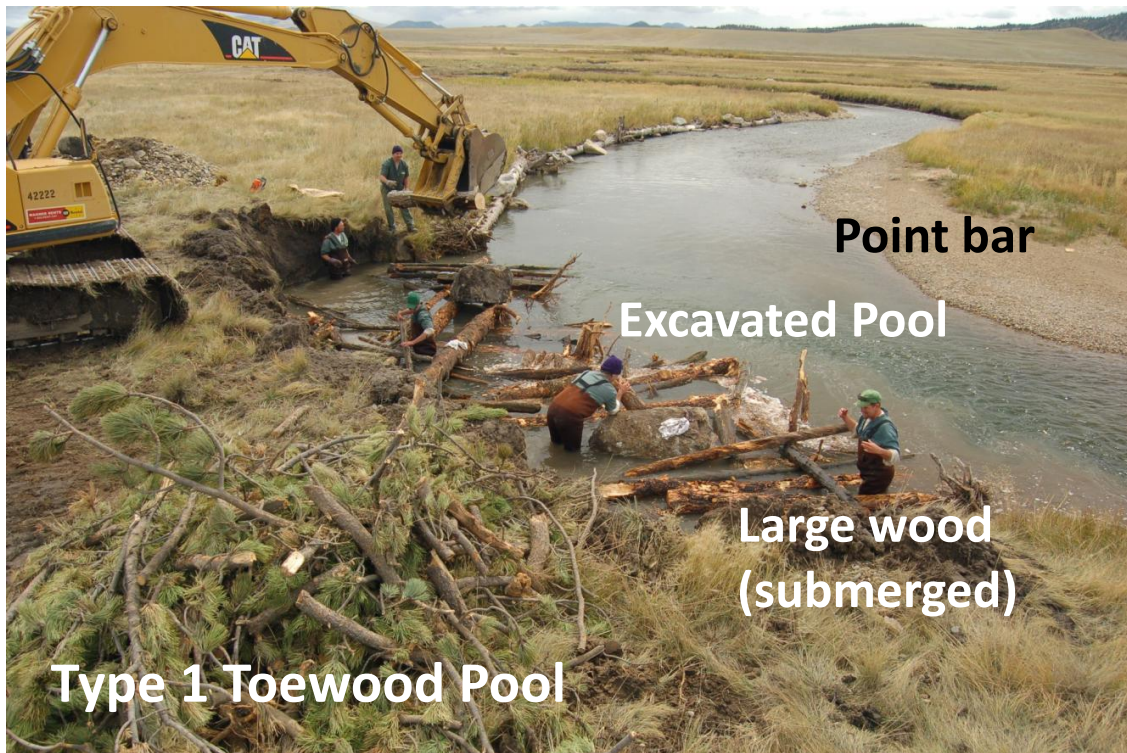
Type 1 toewood pool during construction, consisting of an excavated pool, constructed point bar and introduction of large wood placed at the bank toe of in a haphazard manner.
